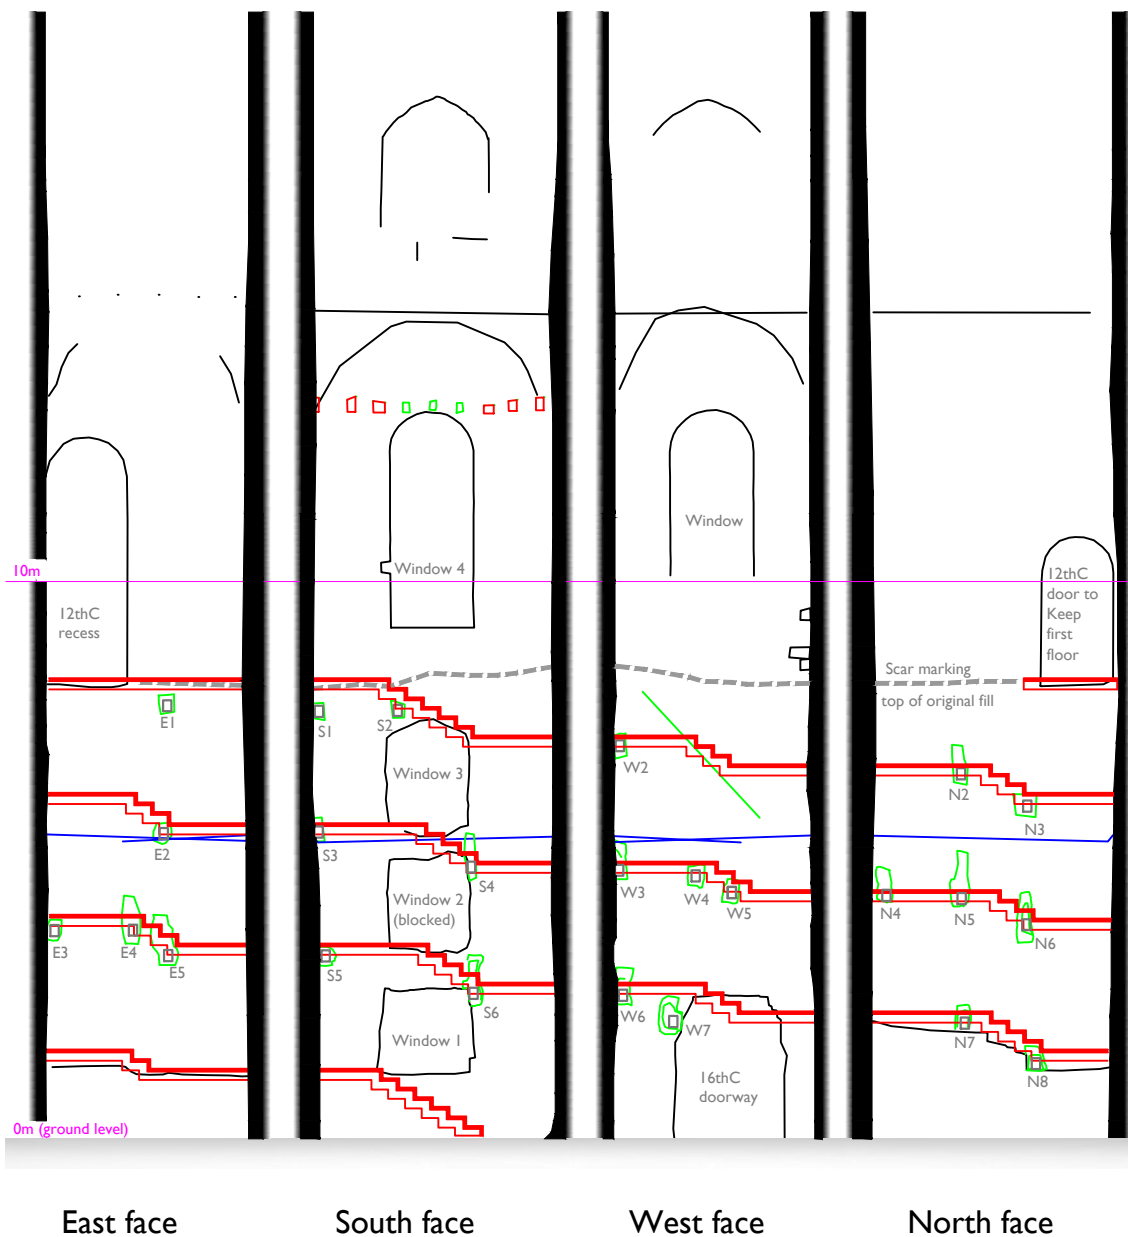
Kenilworth Castle keep, SW corner stair tower surveyed elevations and stair alternate reconstruction with full top landing
